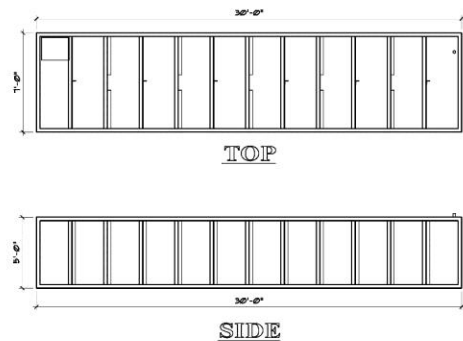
PONTOON "B" FRAMING DETAILS
